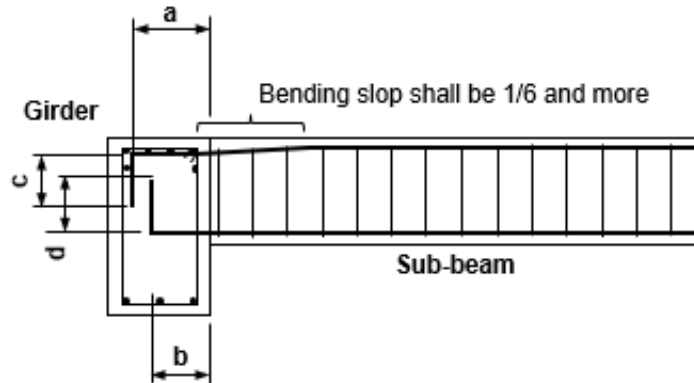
Anchoring of Sub-beam main bar into Girder
